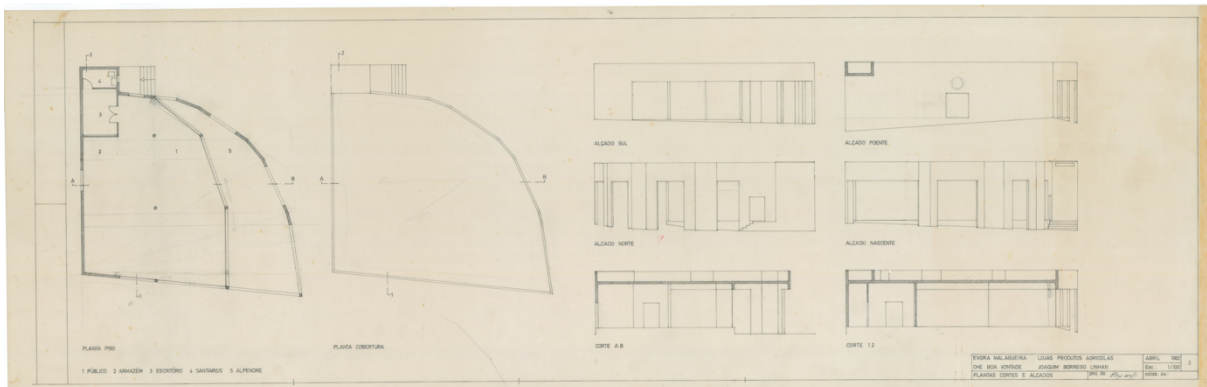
Organic market technical drawings. Side views and sections. Drawing Matter.
